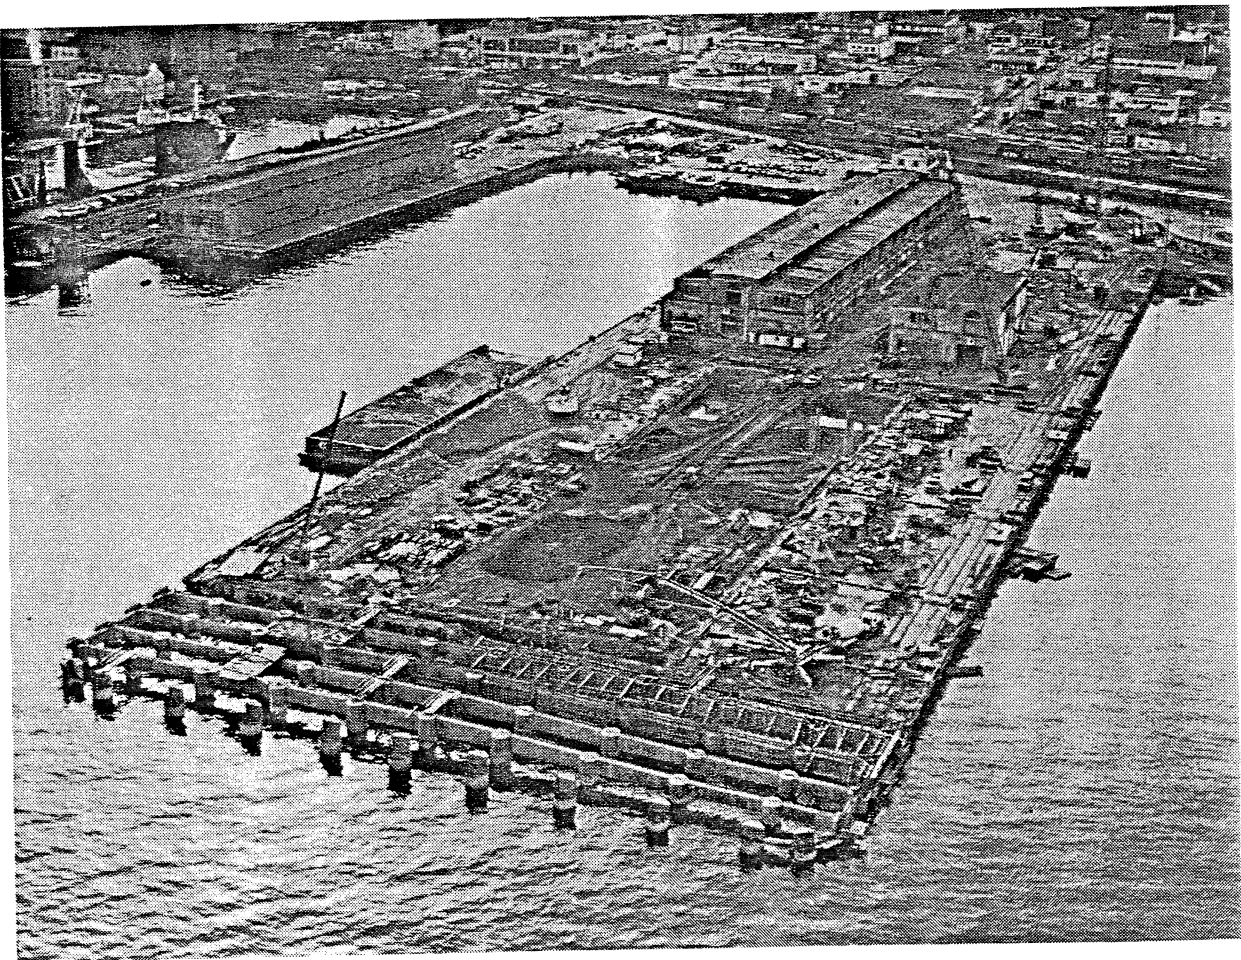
Photograph Showing Ballantyne Pier During Reconstruction (courtesy Peter Kiewit Sons Co. Ltd.)
